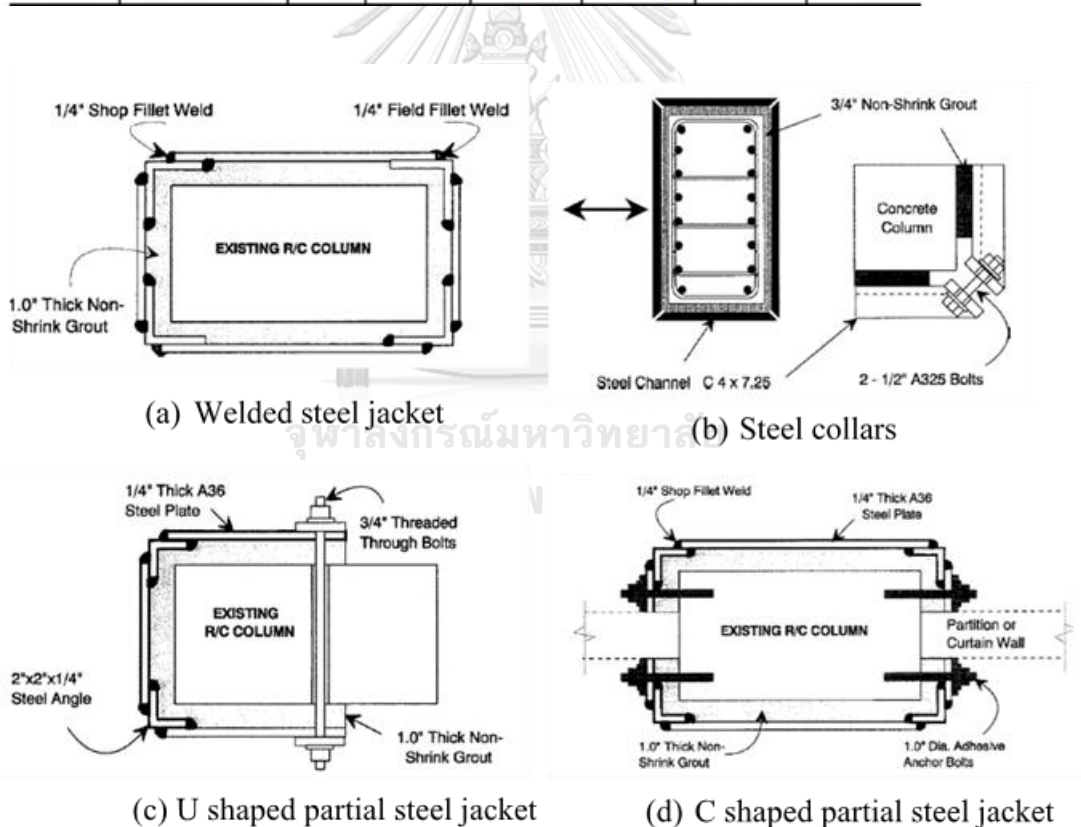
Details of steel jacket (Aboutaha et al., 1999)
